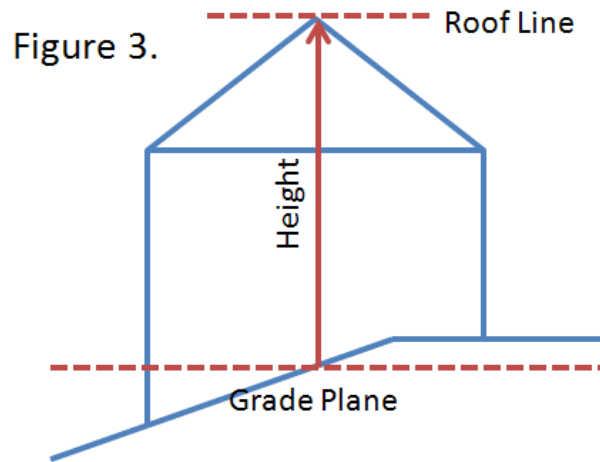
shows how height would be calculated under the proposed revision to the definition.
